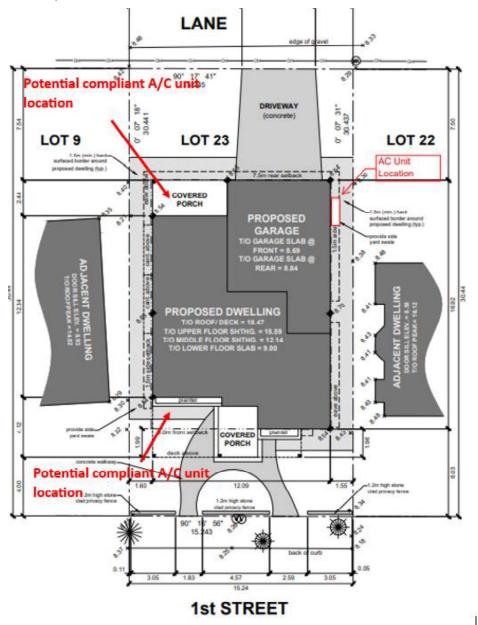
Site plan showing existing and potential locations for an A/C unit
